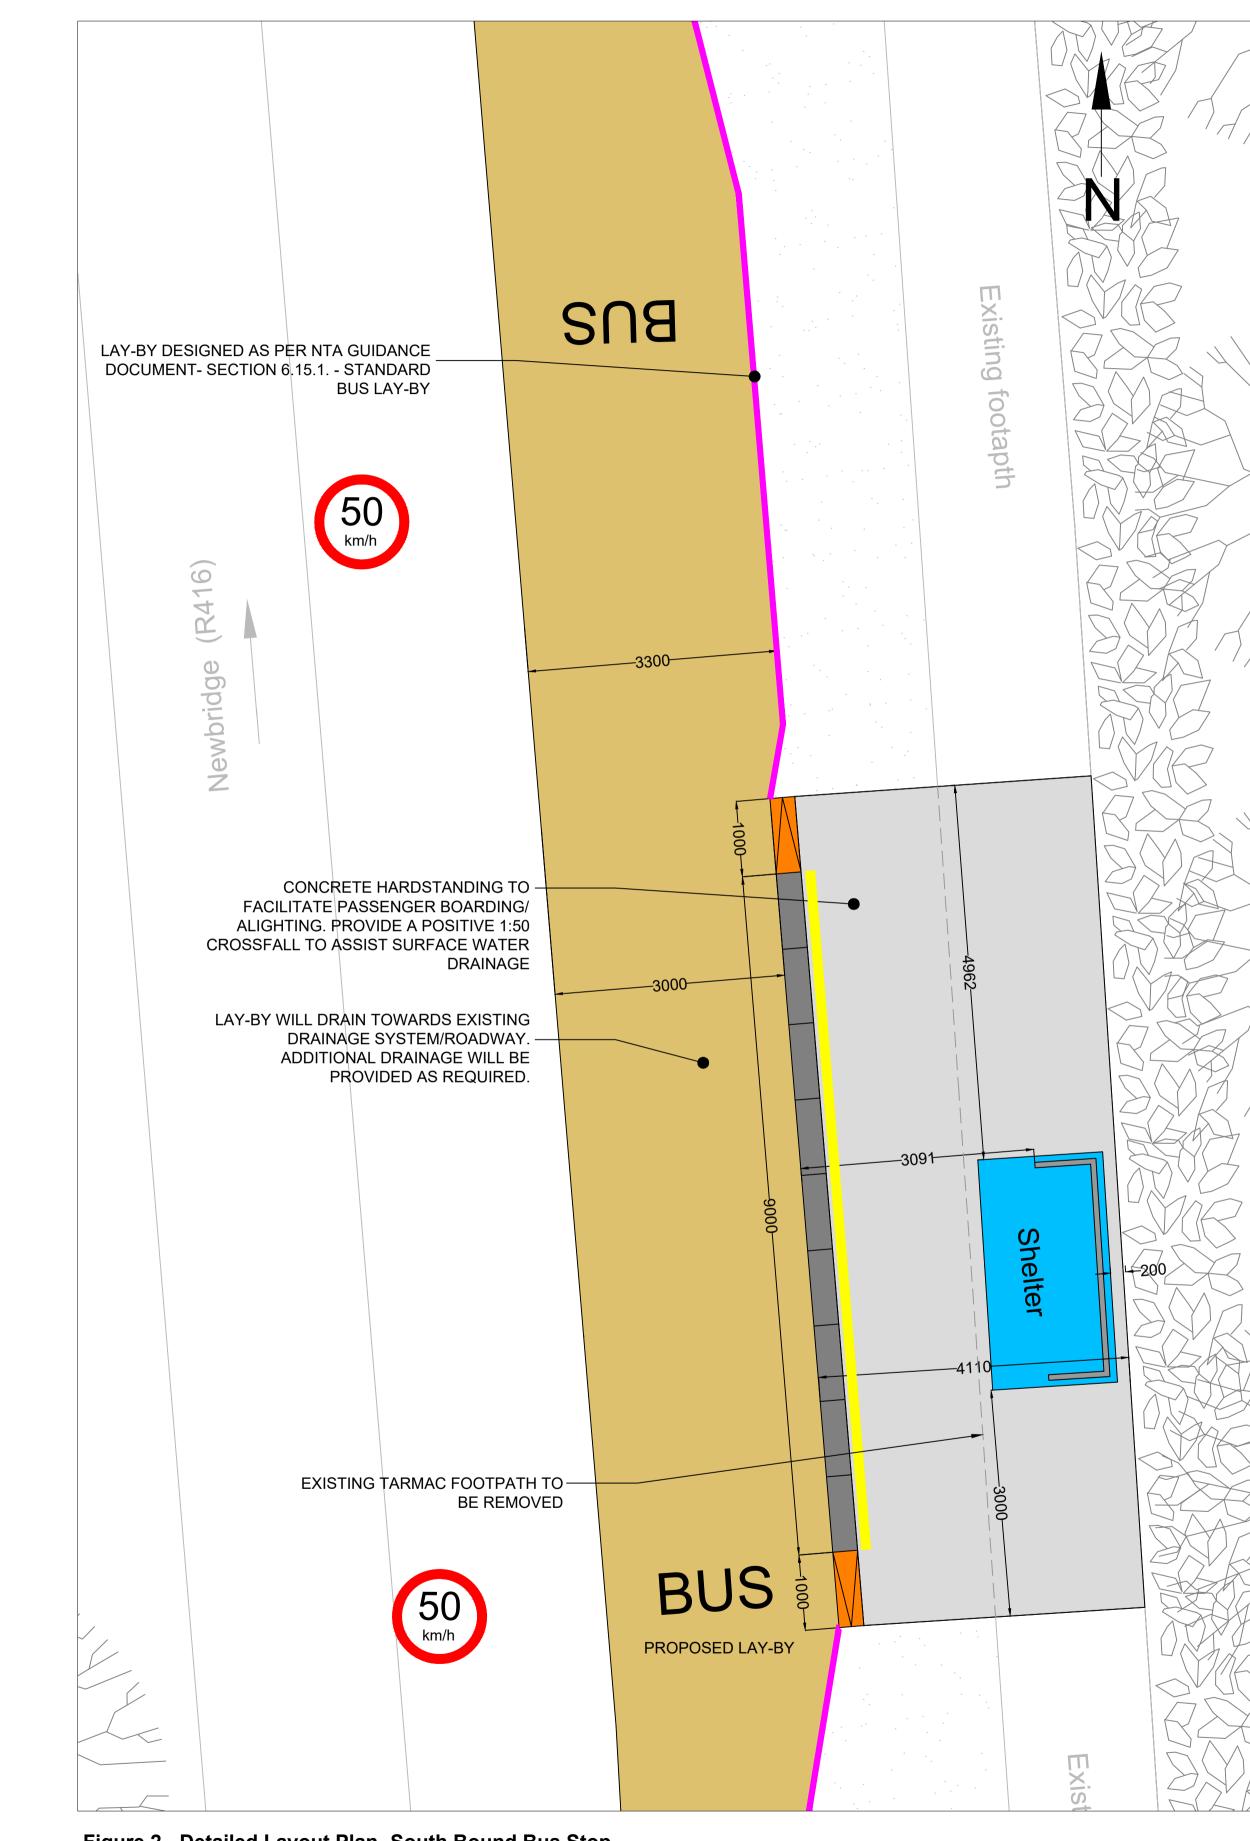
Detailed Layout Plan- South Bound Bus Stop
